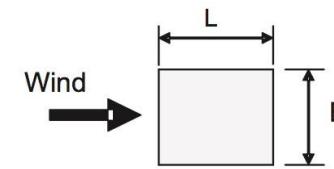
L and B definitions (ASCE 7-10 Section 26)
